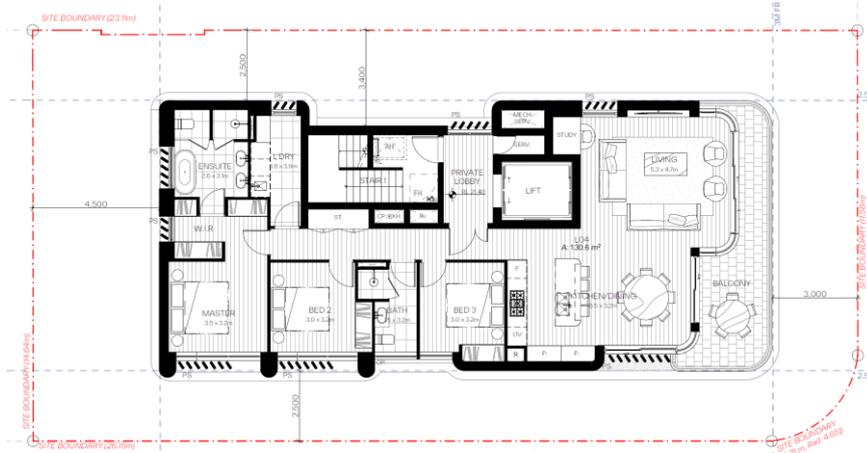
Proposed fourth floor plan – 8 Ormond Gardens, Coogee (Source: PBD Architects)
